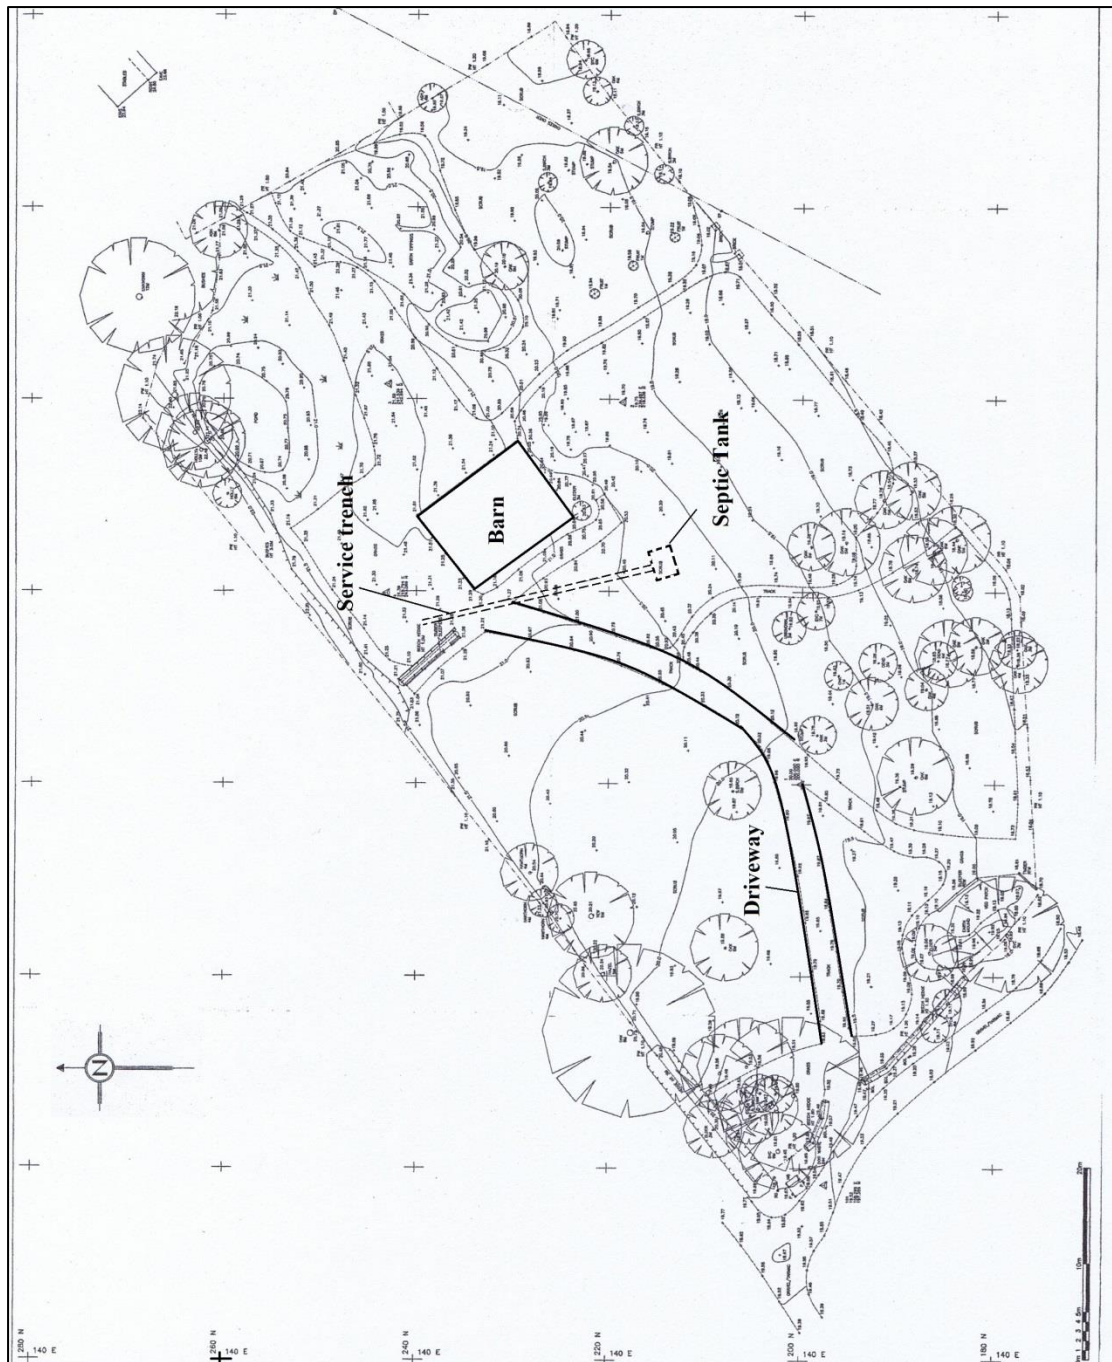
Fishponds Barn, Hastings: Site Plan showing areas monitored
